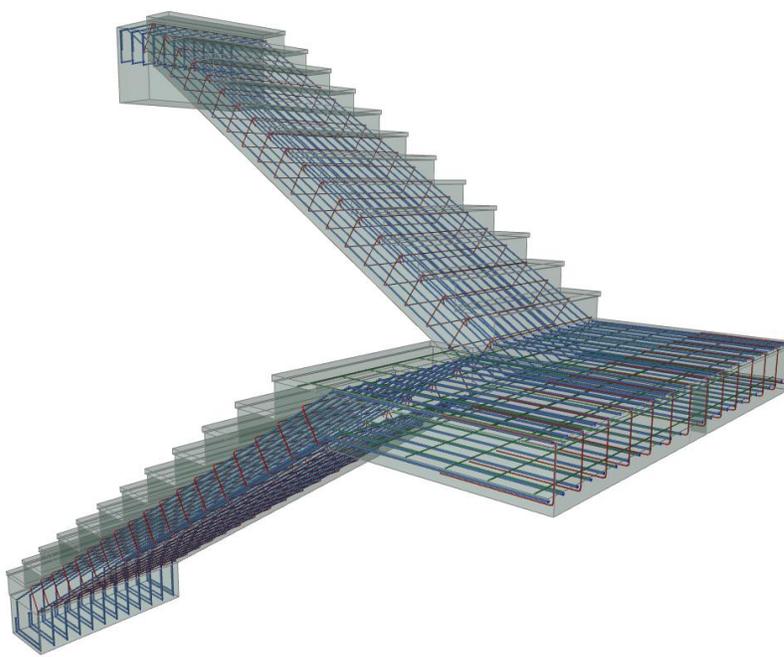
Structural Staircase and Column 3D Rebar (Image courtesy of CCIT)
